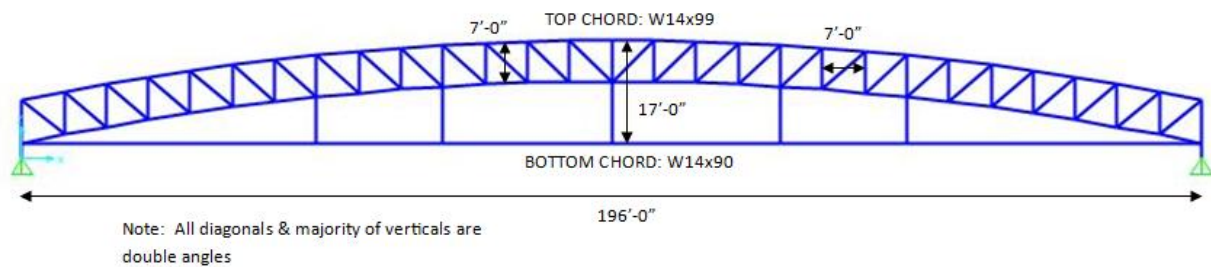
Proposed Tied Arch Truss - Preliminary Design & Member Sizes
